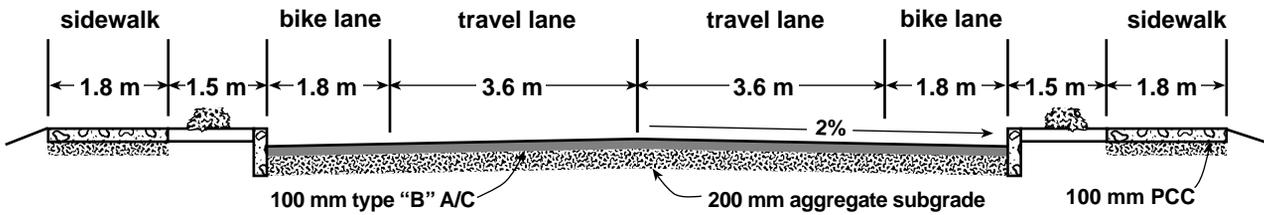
Typical urban roadway cross-section with bike lanes and sidewalks
